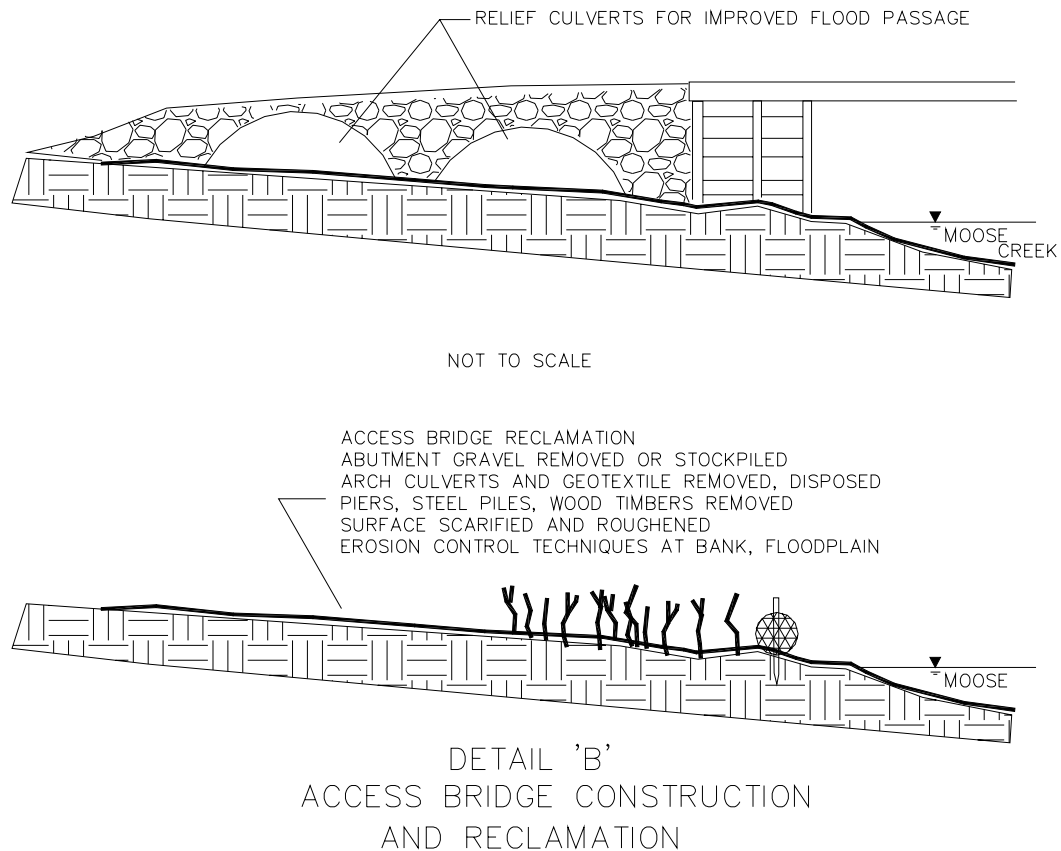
Detail 'B' showing relief culverts for bridge approach, and reclamation details.
